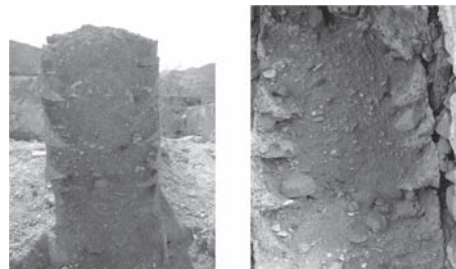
Section of a rammed earth walls with facing made of bricks and lime mortar in Ténès. (Alliche. S., 2011).
